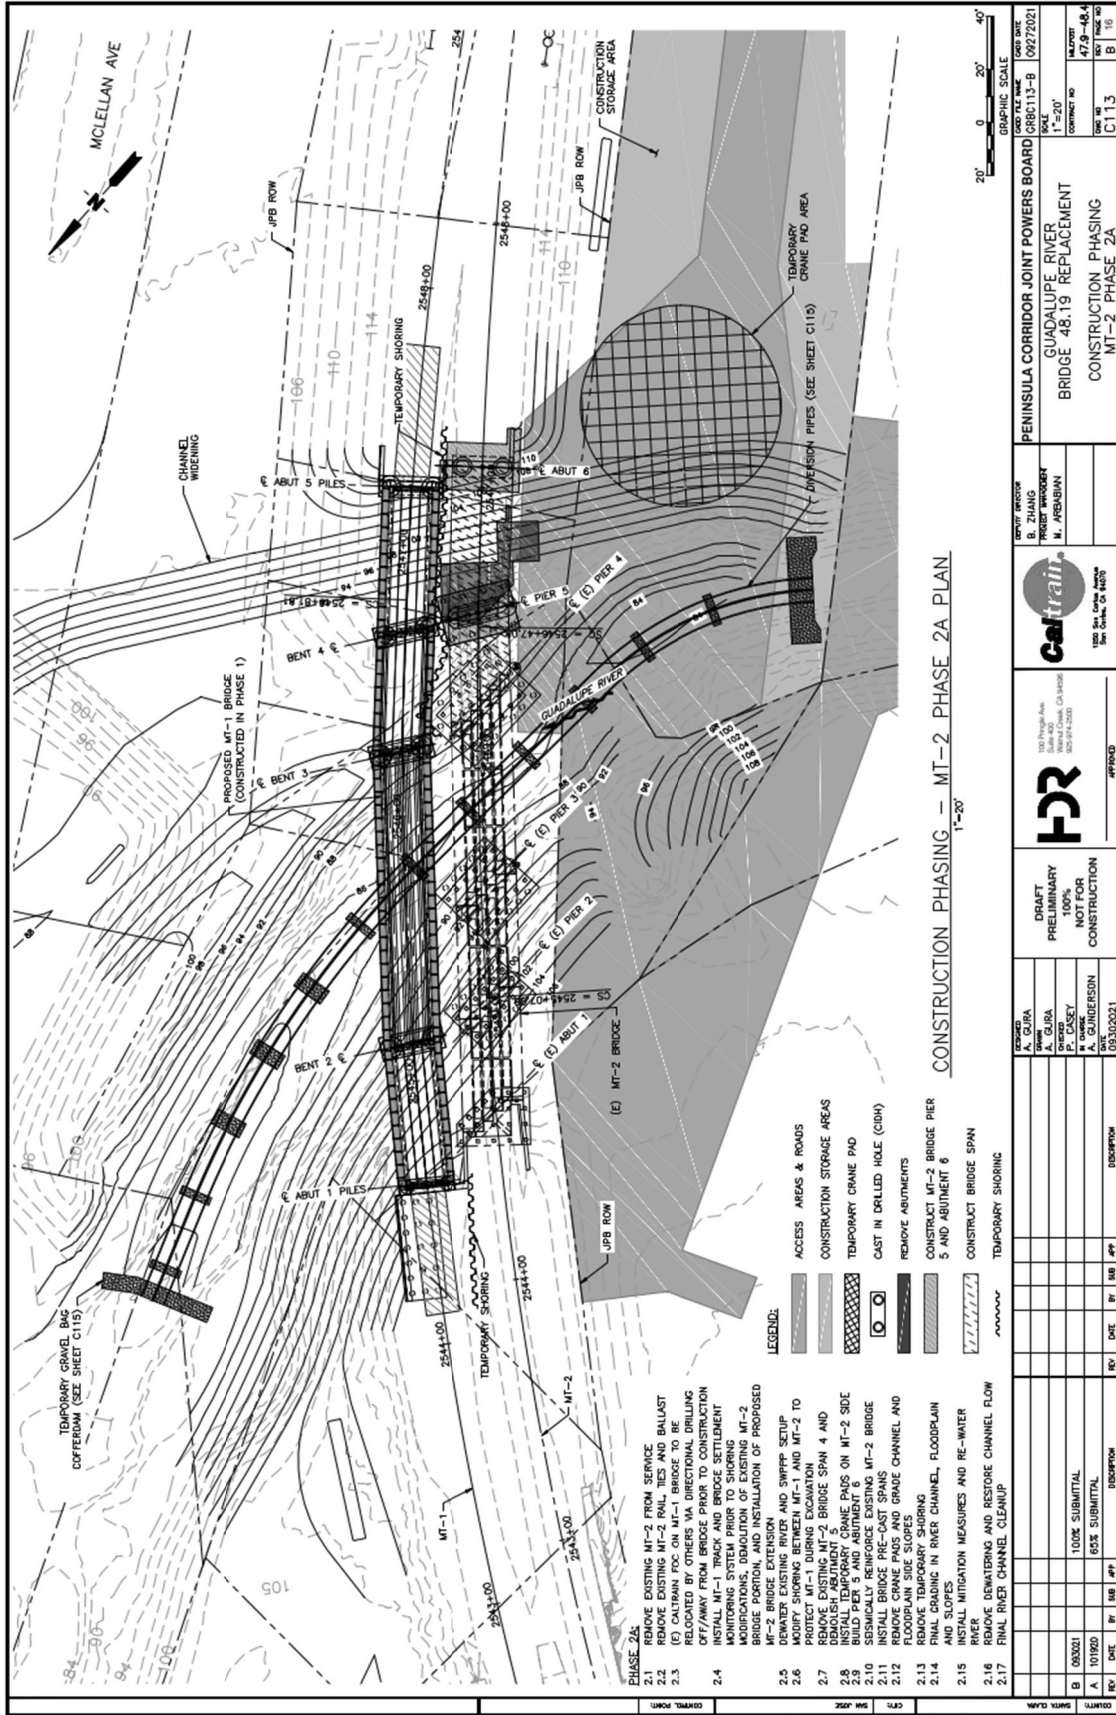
Construction Access Plan in 2021 100% Design: Sheet C113
